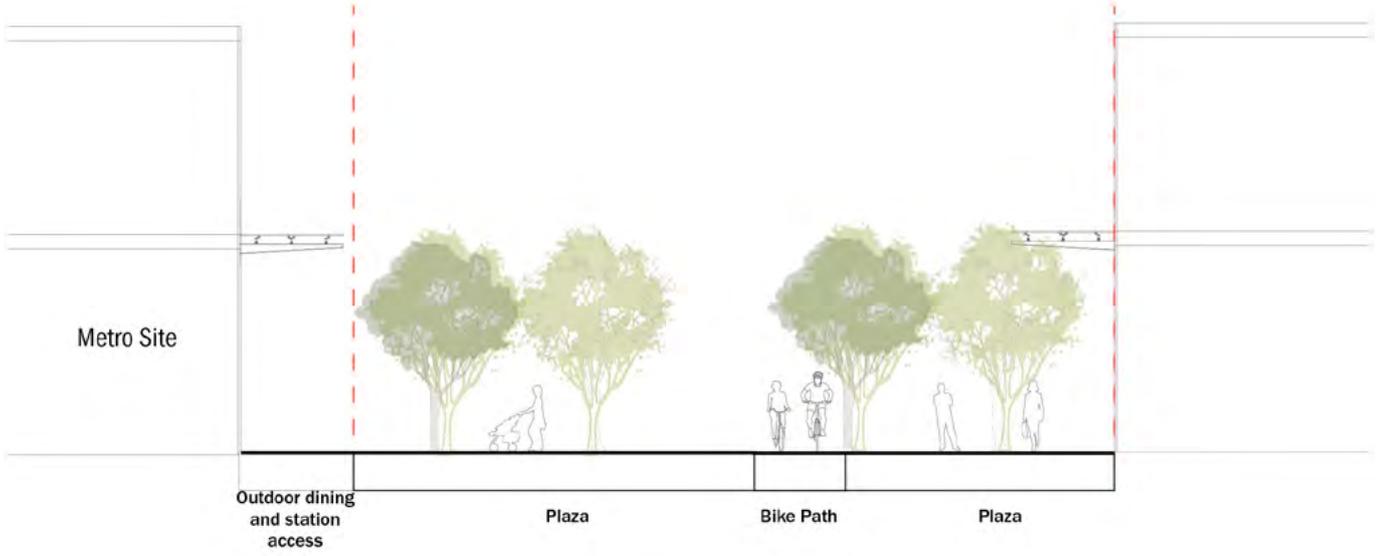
/ Section 01 - Indicative Union Street East Outcome
